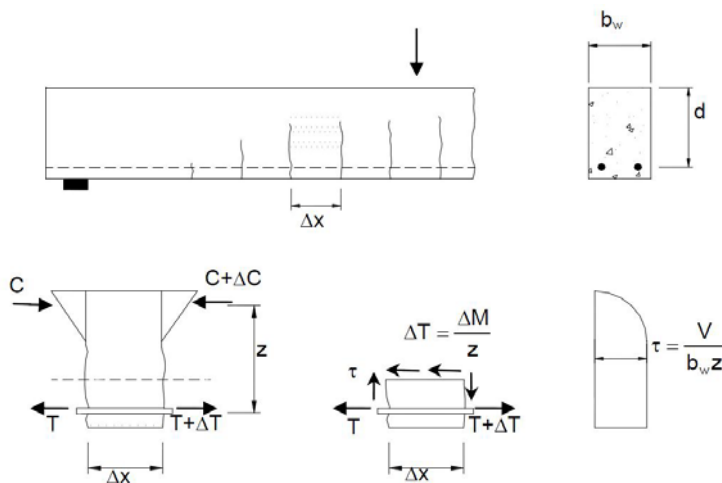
shear stress distribution in a reinforced concrete beam with flexural cracks
